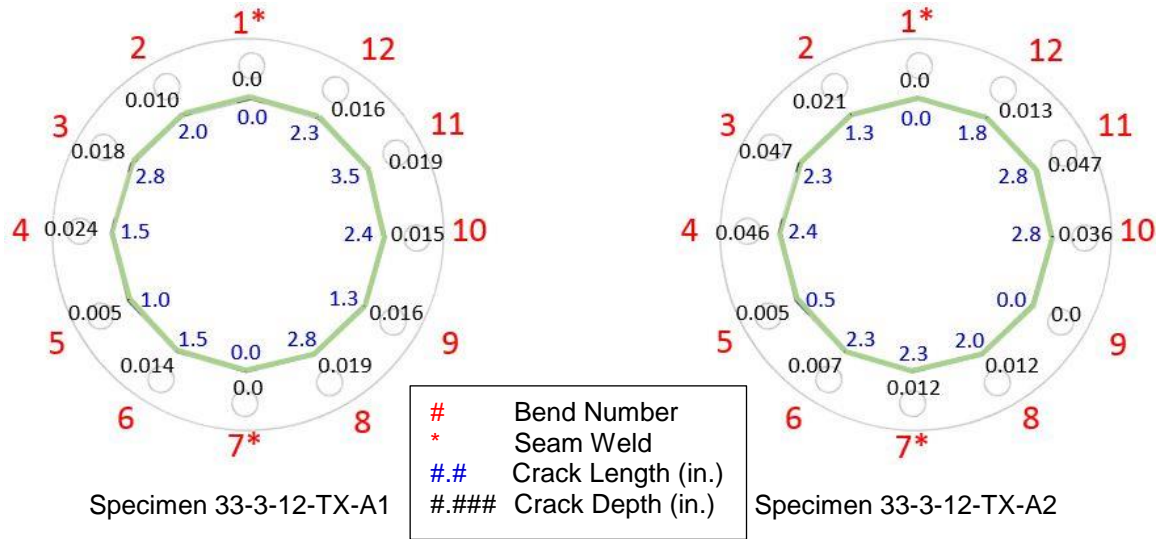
Specimens 33-3-12-TX-A1 and 33-3-12-TX-A2: Cracks after 11.9 Million Fatigue Cycles
